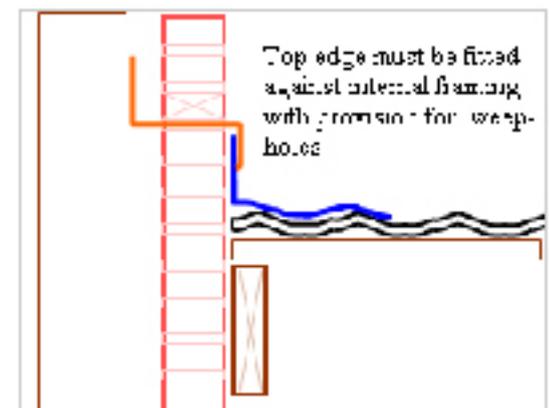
Cavity flashing fixed to timber frame and fitted to outside of masonry wall
